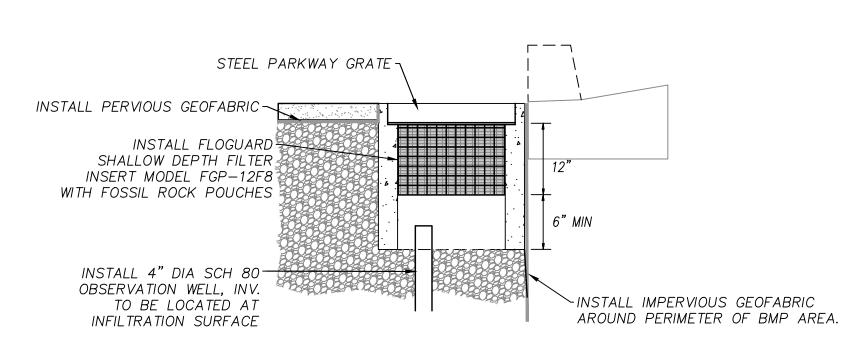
DETAIL 'C' PERMEABLE PAVEMENT SECTION NOT TO SCALE
